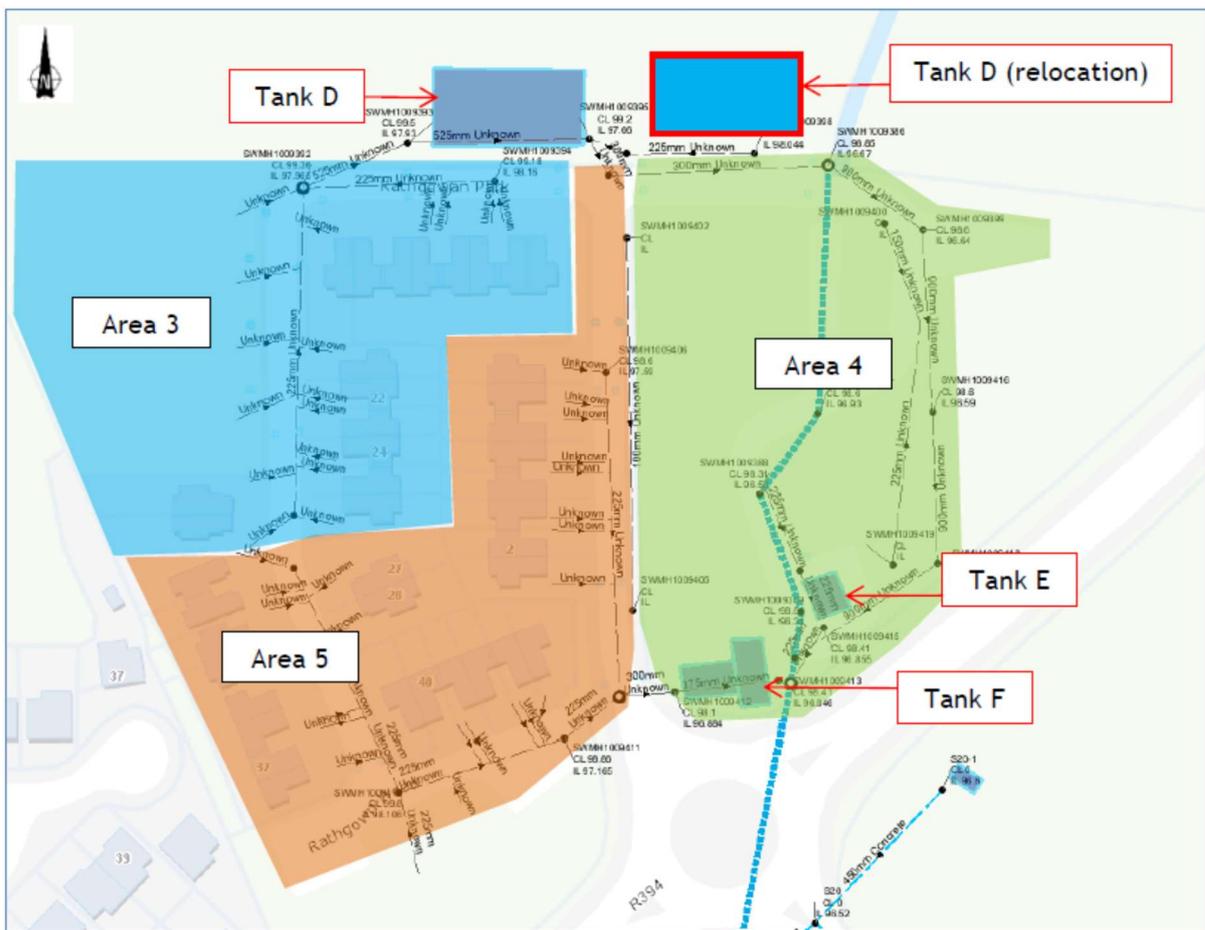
Extract from Figure 2-3 of Punch Engineering Planning Report “Existing Attenuation Tank Layout”
